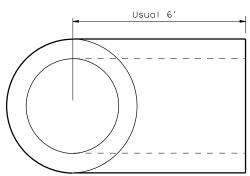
DETAIL SHOWING METHOD OF CAPPING ABANDONED MANHOLES OR INLETS (GRADED OR PAVED AREAS)
